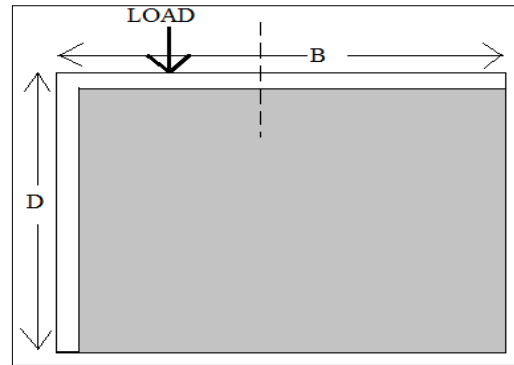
Cross Section X-X of Bi-Angle Shaped Footing Subjected to Two Ways Eccentric Loading.
